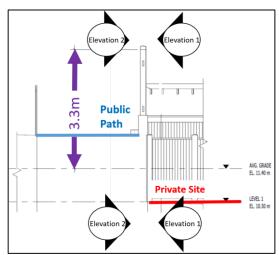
Fence and Retaining Wall Section (max. height at pergola and garbage/generator enclosure)
